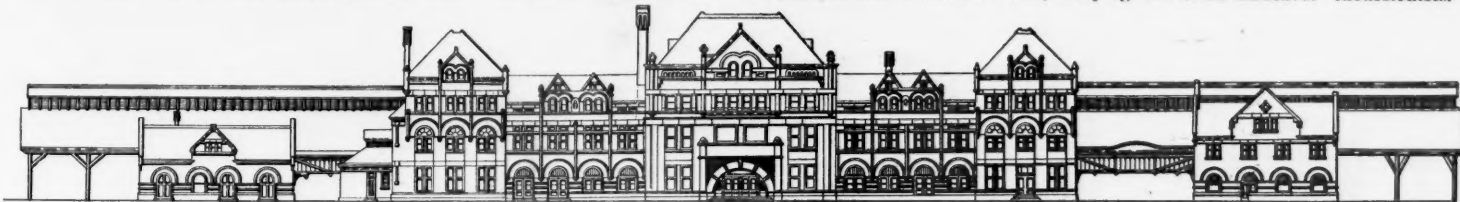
Union Passenger Station at Montgomery, Ala., Louisville & Nashville Railroad—Street Elevation.
